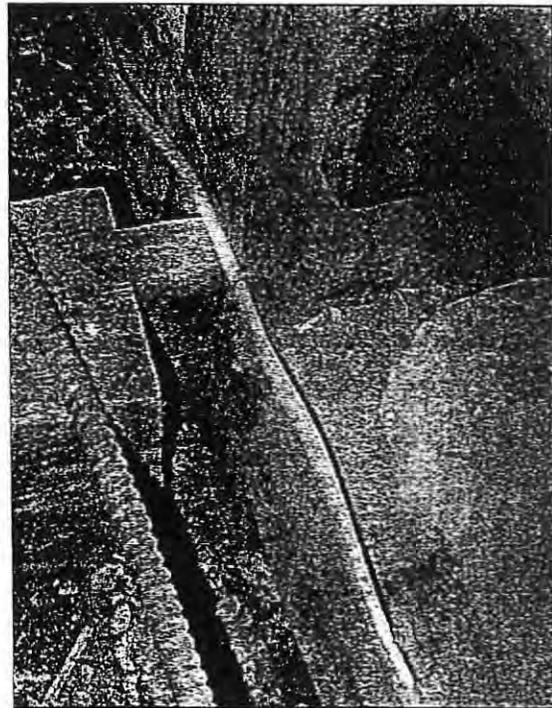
Dutch House. Detail showing intersection of principal post, girts, and later lean-to joist.
